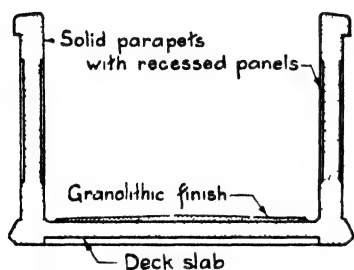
Cross Section of Parapet Girder Footbridge.
